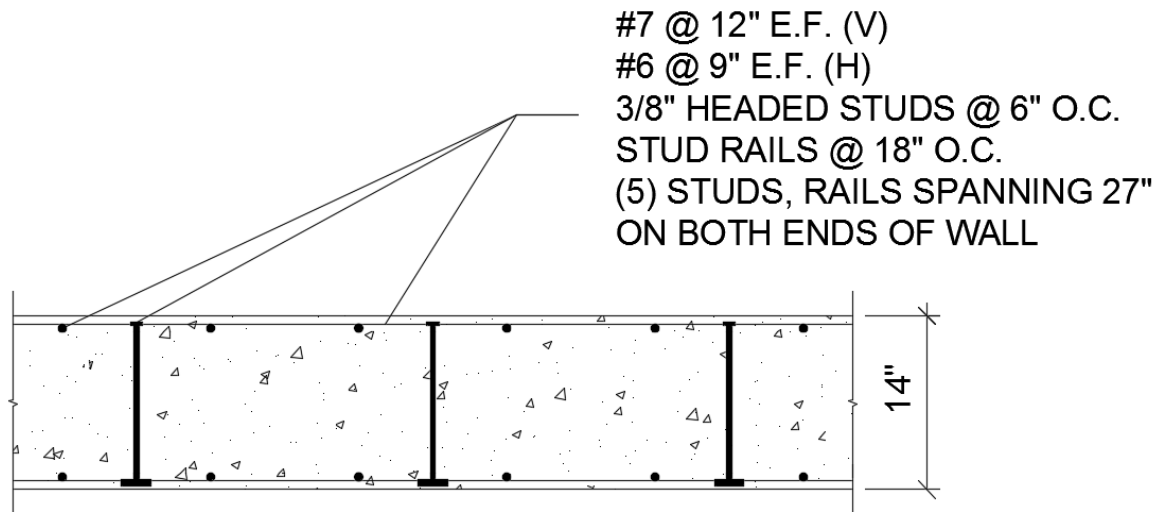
New exterior wall, cross-section at the 5th - 6th floor level based on tsunami design requirements.
